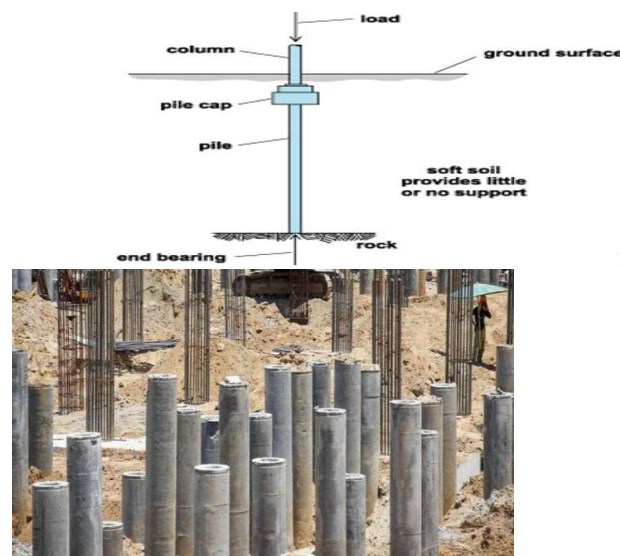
A typical pile foundation;* Source: Constro Facilitator, 2021.
